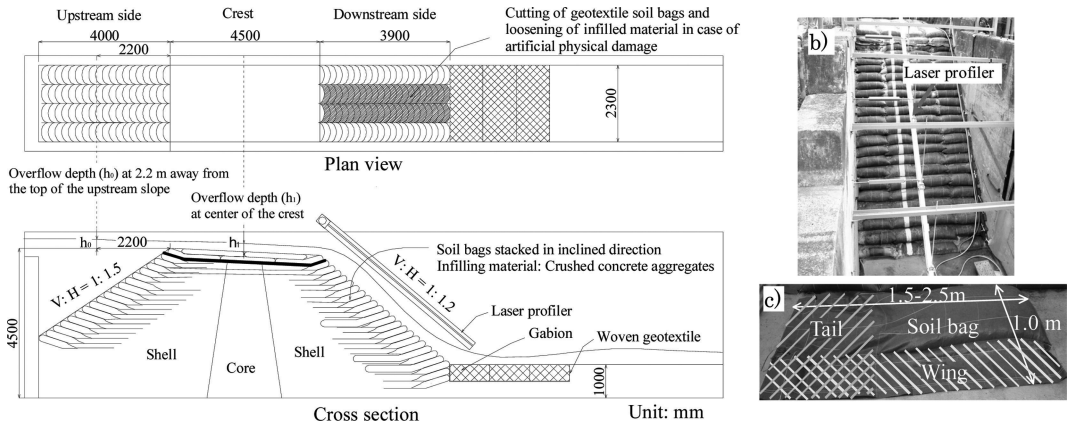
Large-scale overflow-induced collapse test: a) Plan view and cross section of full-scale small earth dam; b) Downstream slope of constructed GSET-spillway model; and c) Large-size soil bag integrated with wing and tail.
